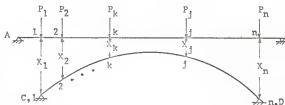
Redundant forces in the ties of a girder-arch bridge.
